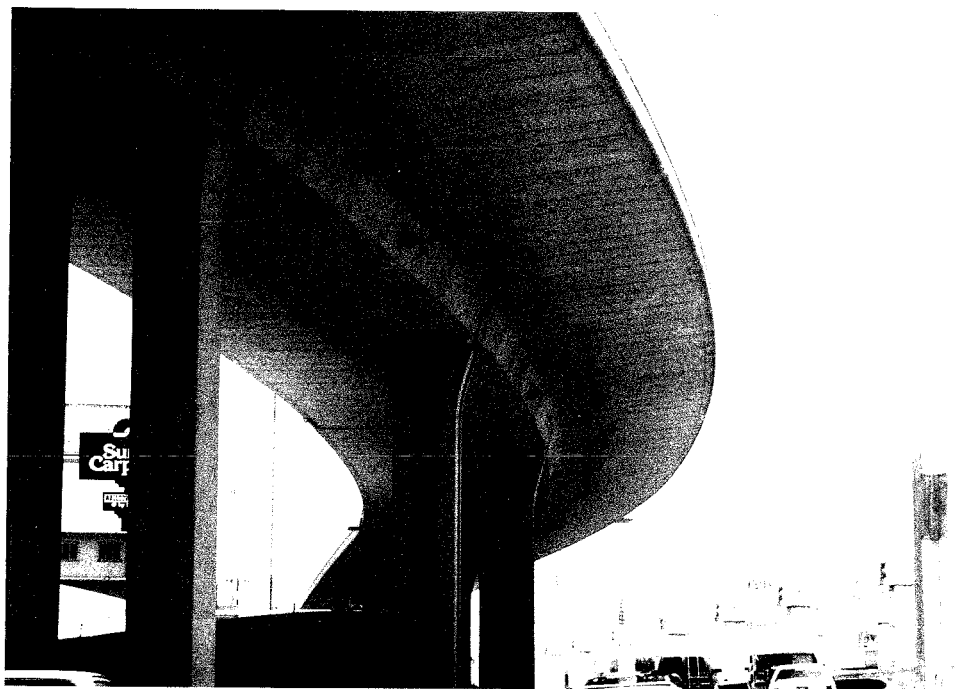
San Antonio "Y" Concrete Box Girder.
